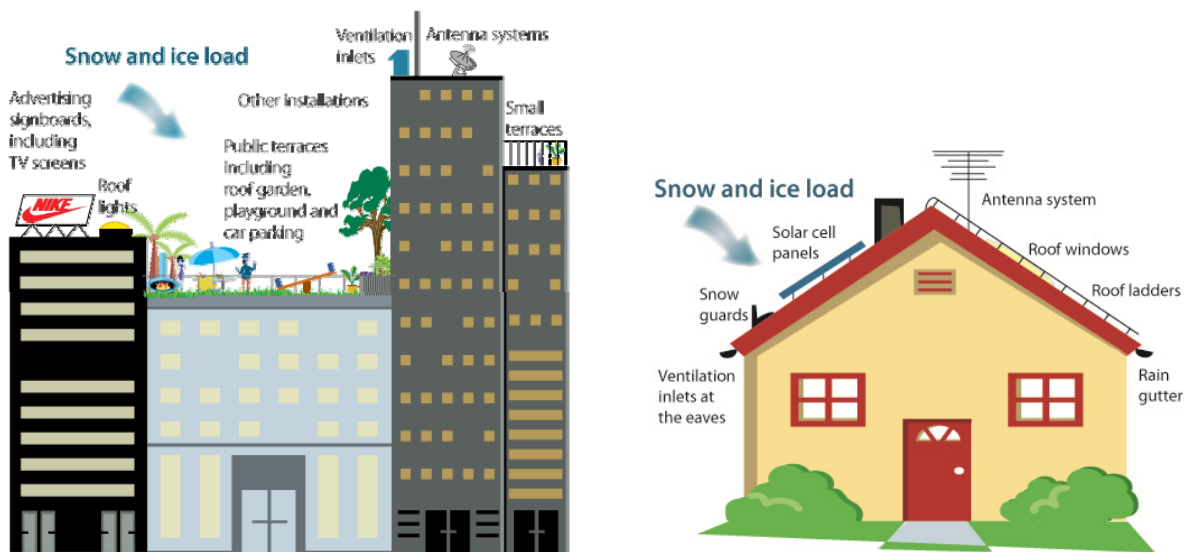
Various active roof installations for flat (left) and pitched (right) roofs. (Illustrations: SINTEF Building and Infrastructure).
